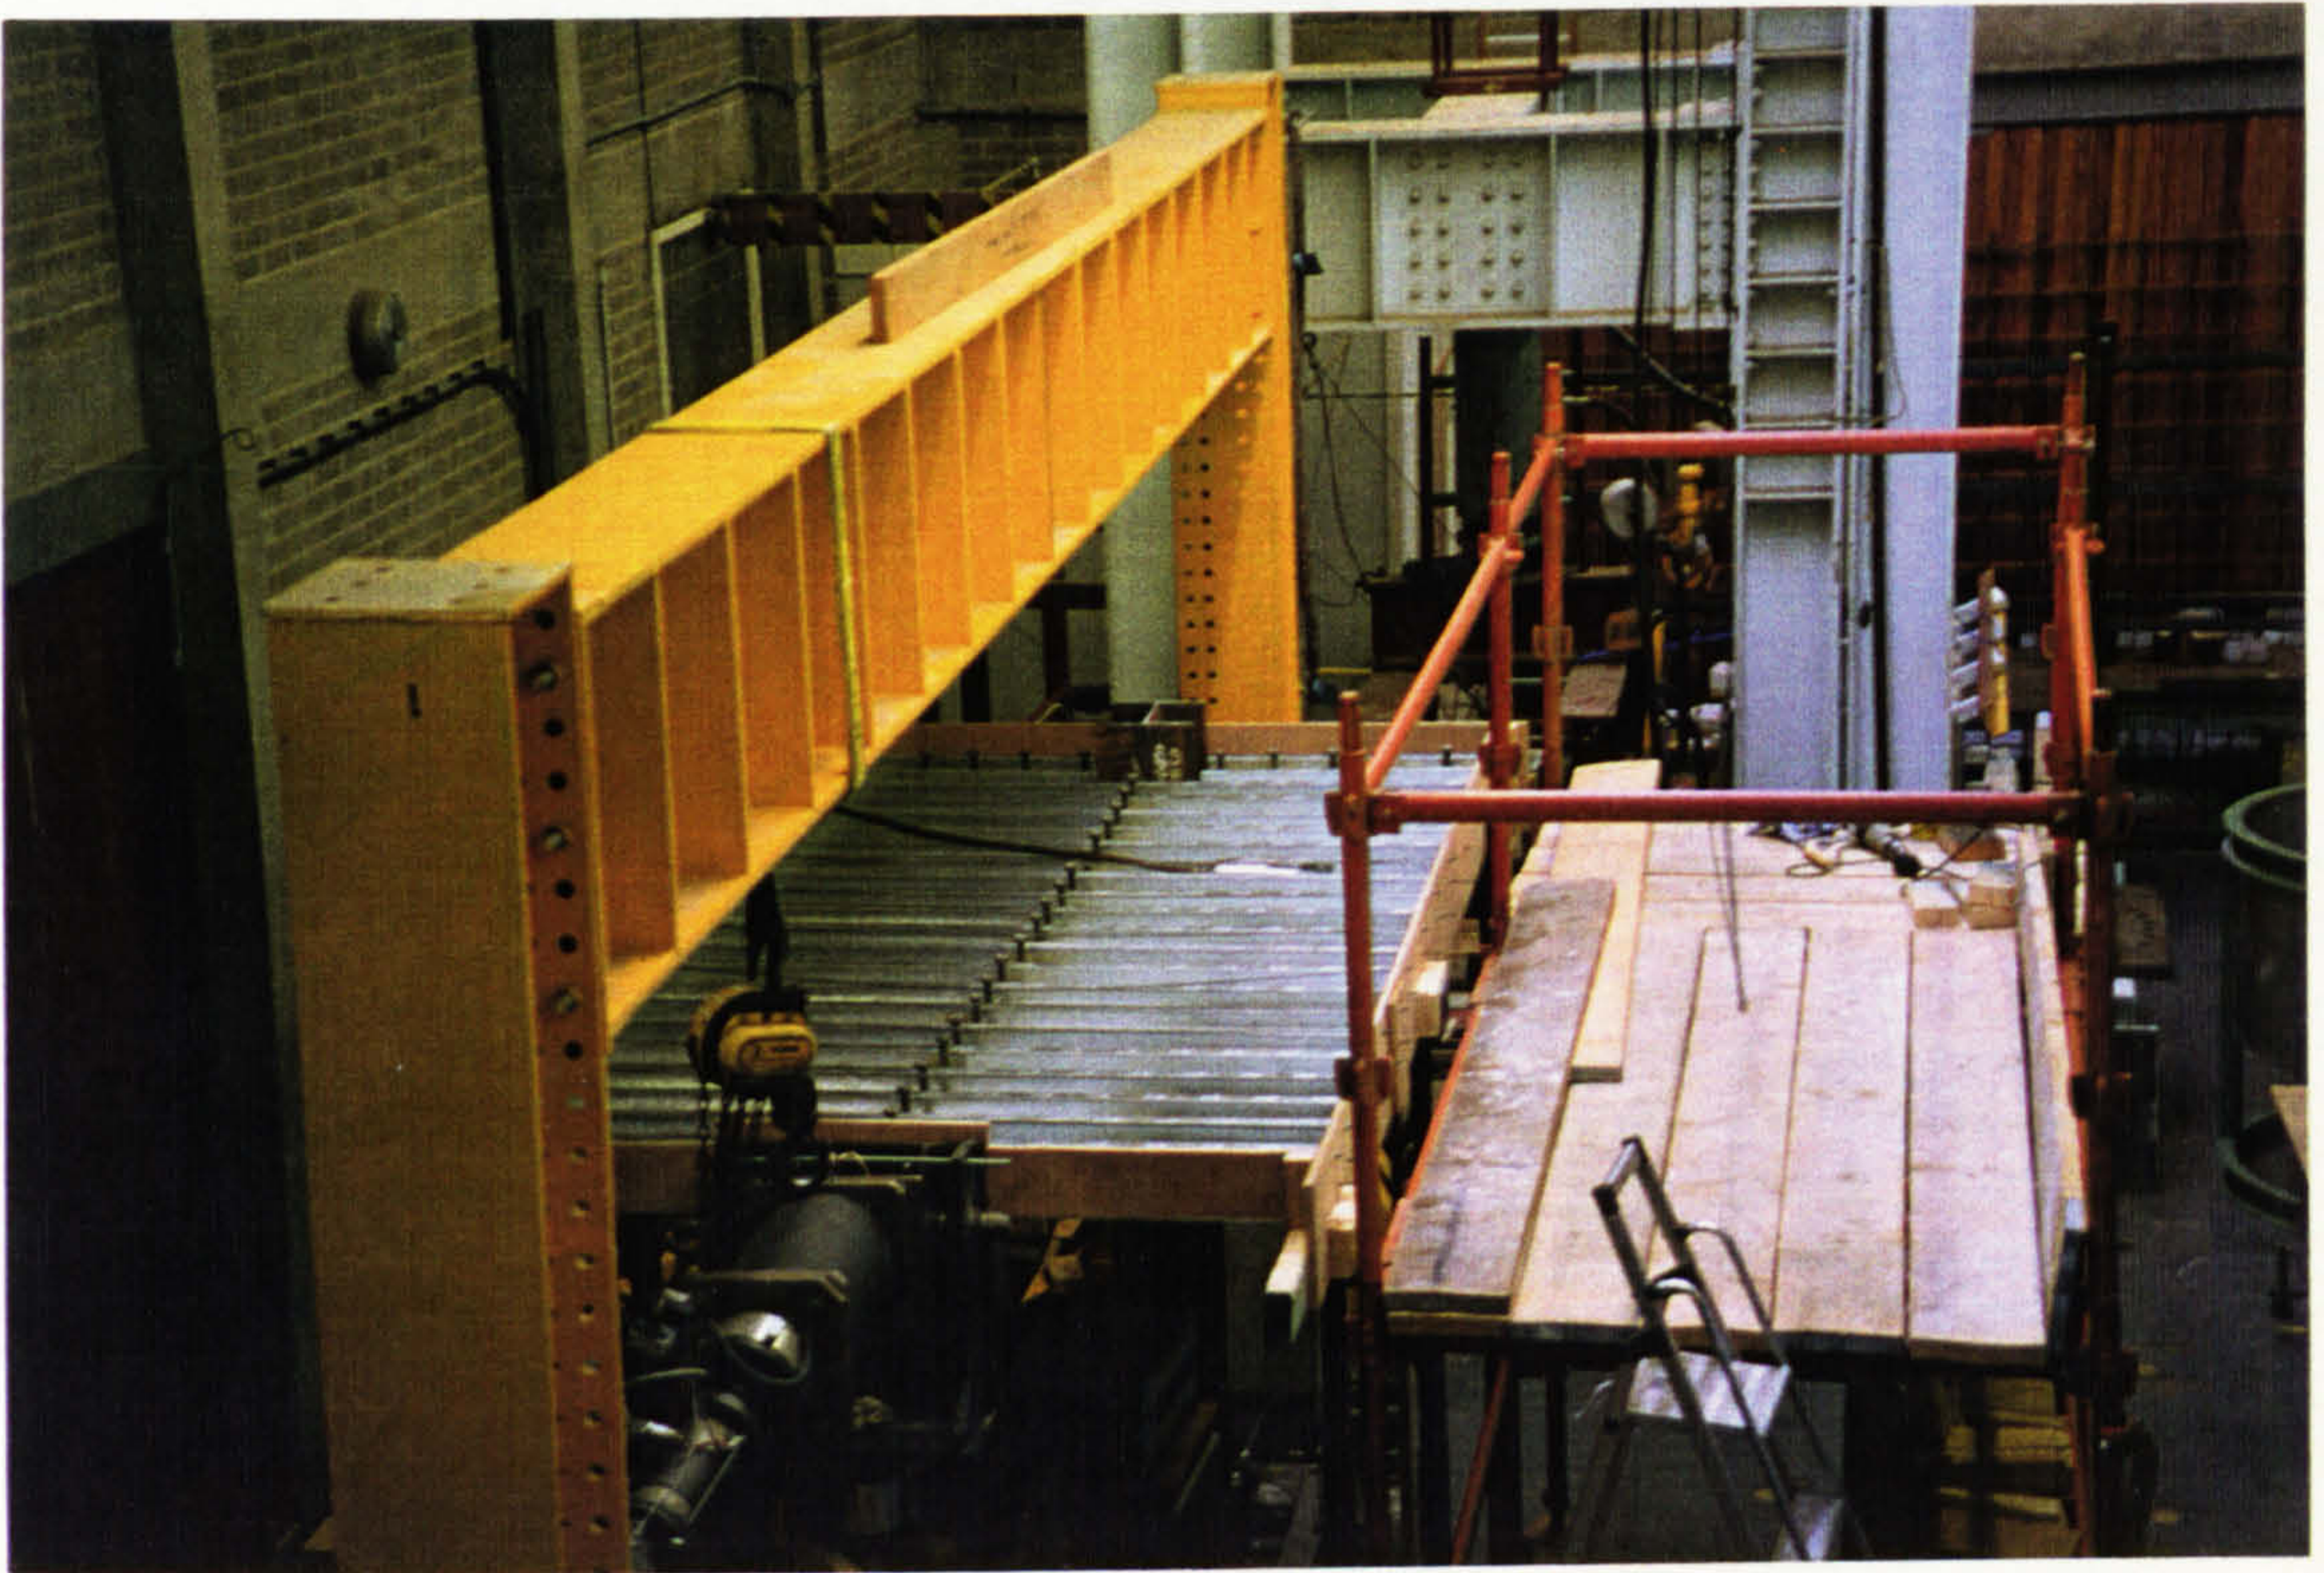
TEST PIECE UNDER CONSTRUCTION
